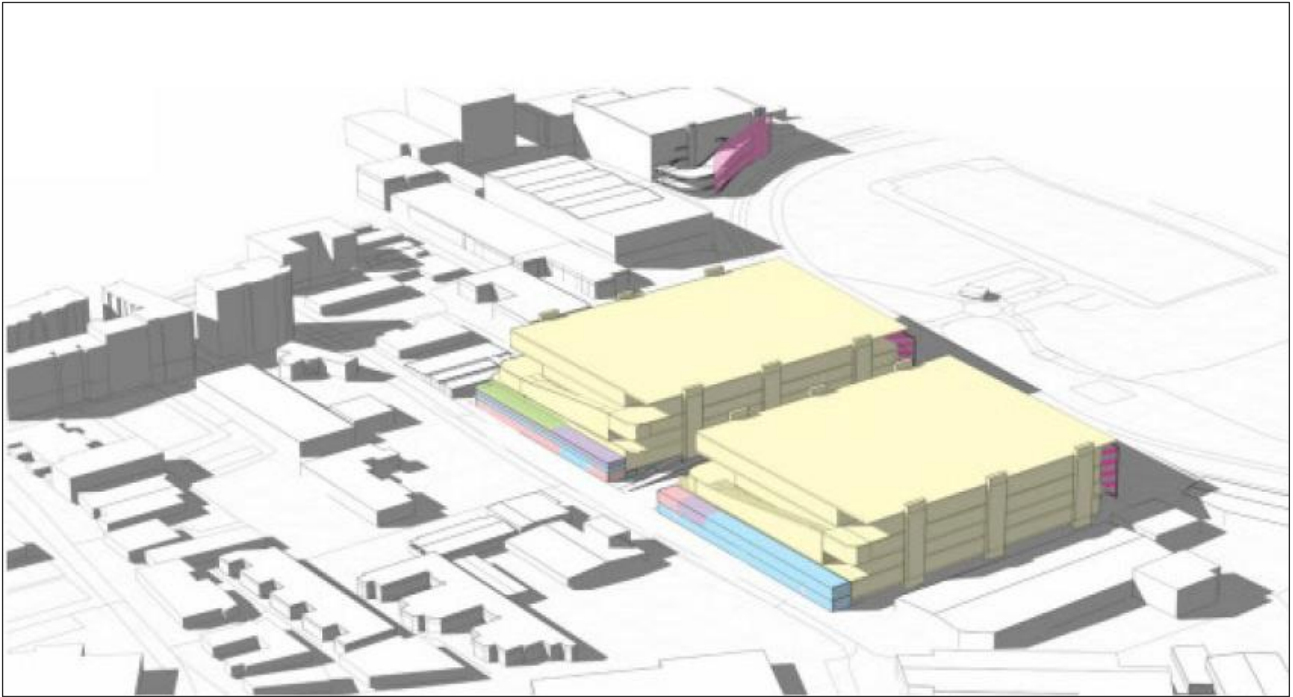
Development Concept – indicative massing (source: Planning proposal, 2023)
